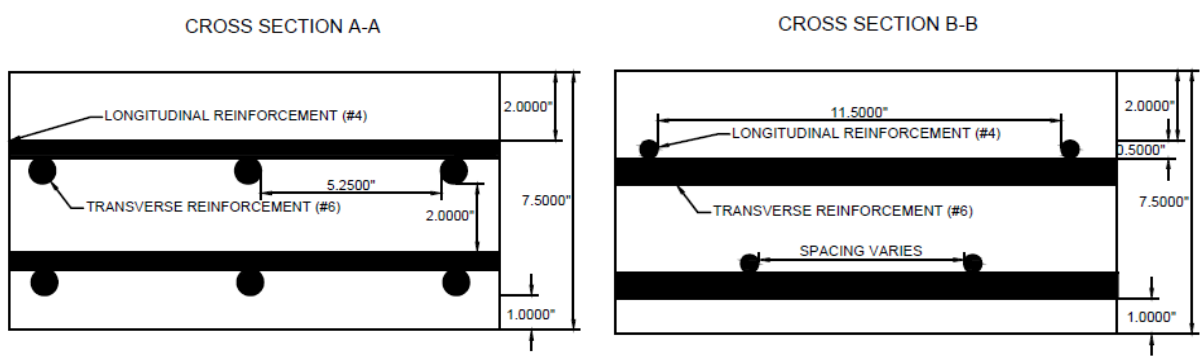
Longitudinal (AA') and transverse (BB') cross sections of the bridge deck showing reinforcement details.
